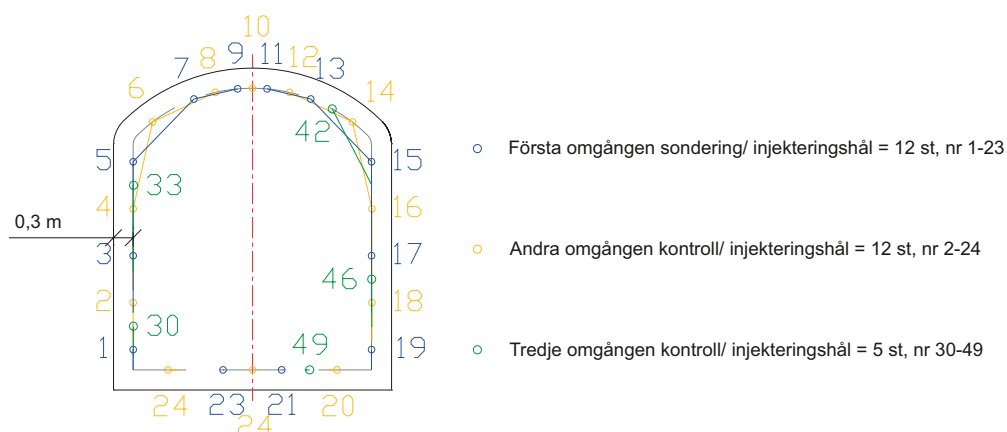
below shows grouting fan 5 inside tunnel contour and in relatively dense rock.
